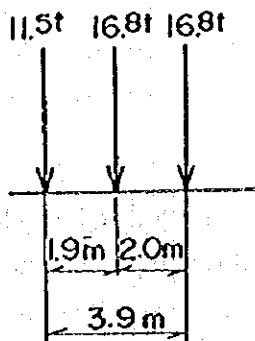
Design Load for Railway Bridges in Japan (Non-Electrified Sections)
